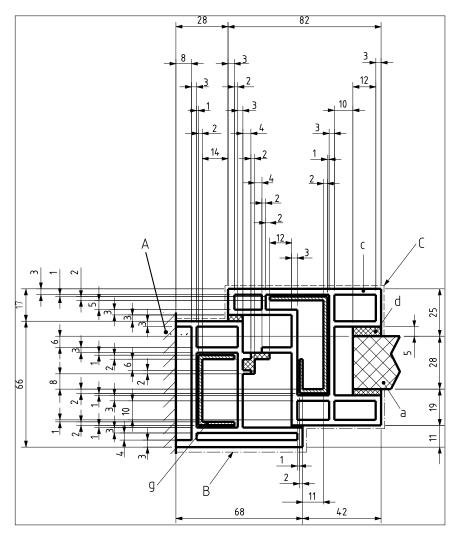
PVC-frame section with steel reinforcement and insulation panel ($b_{\rm f}$ = 110 mm)
